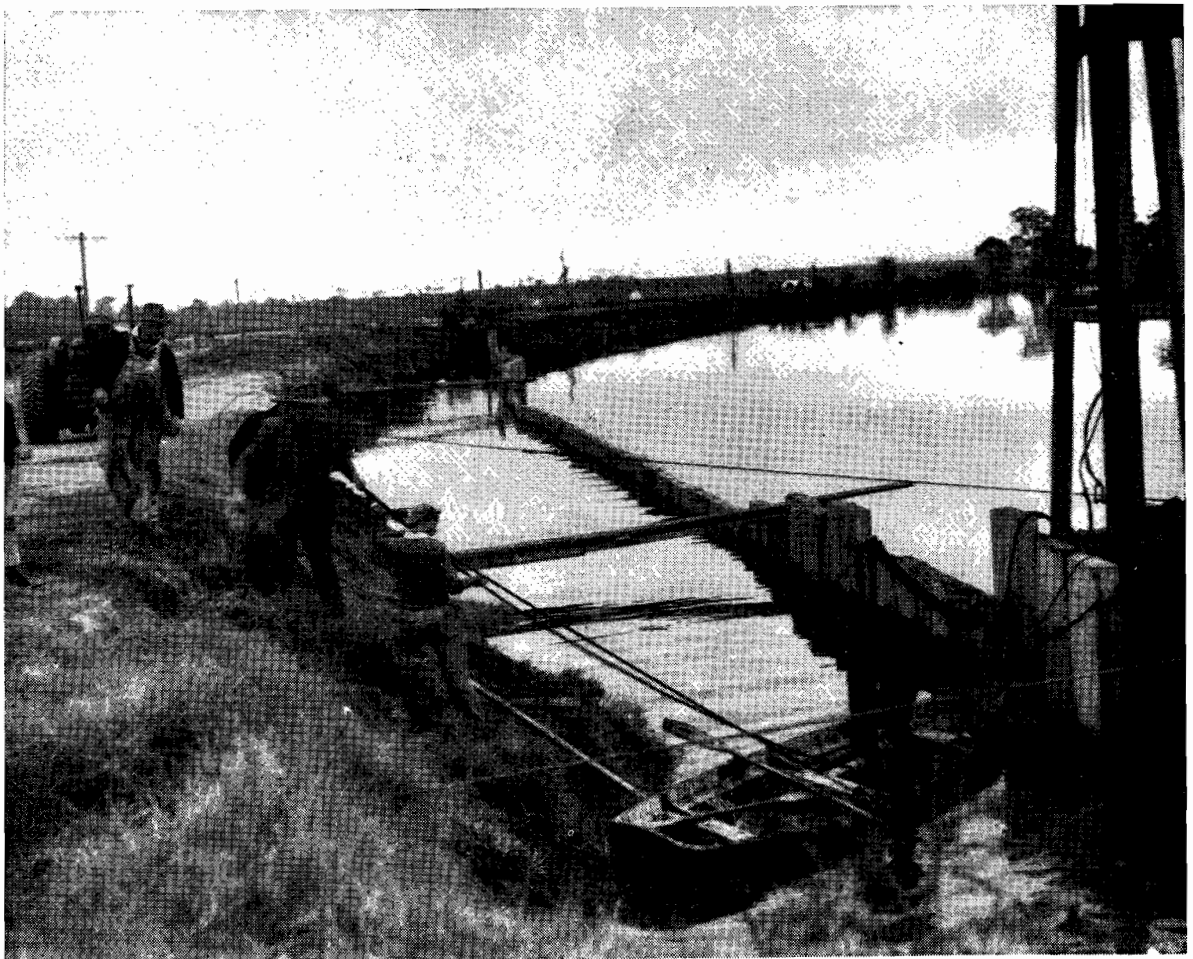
Flood protection work along Paynesville Road on banks of Mitchell River.
